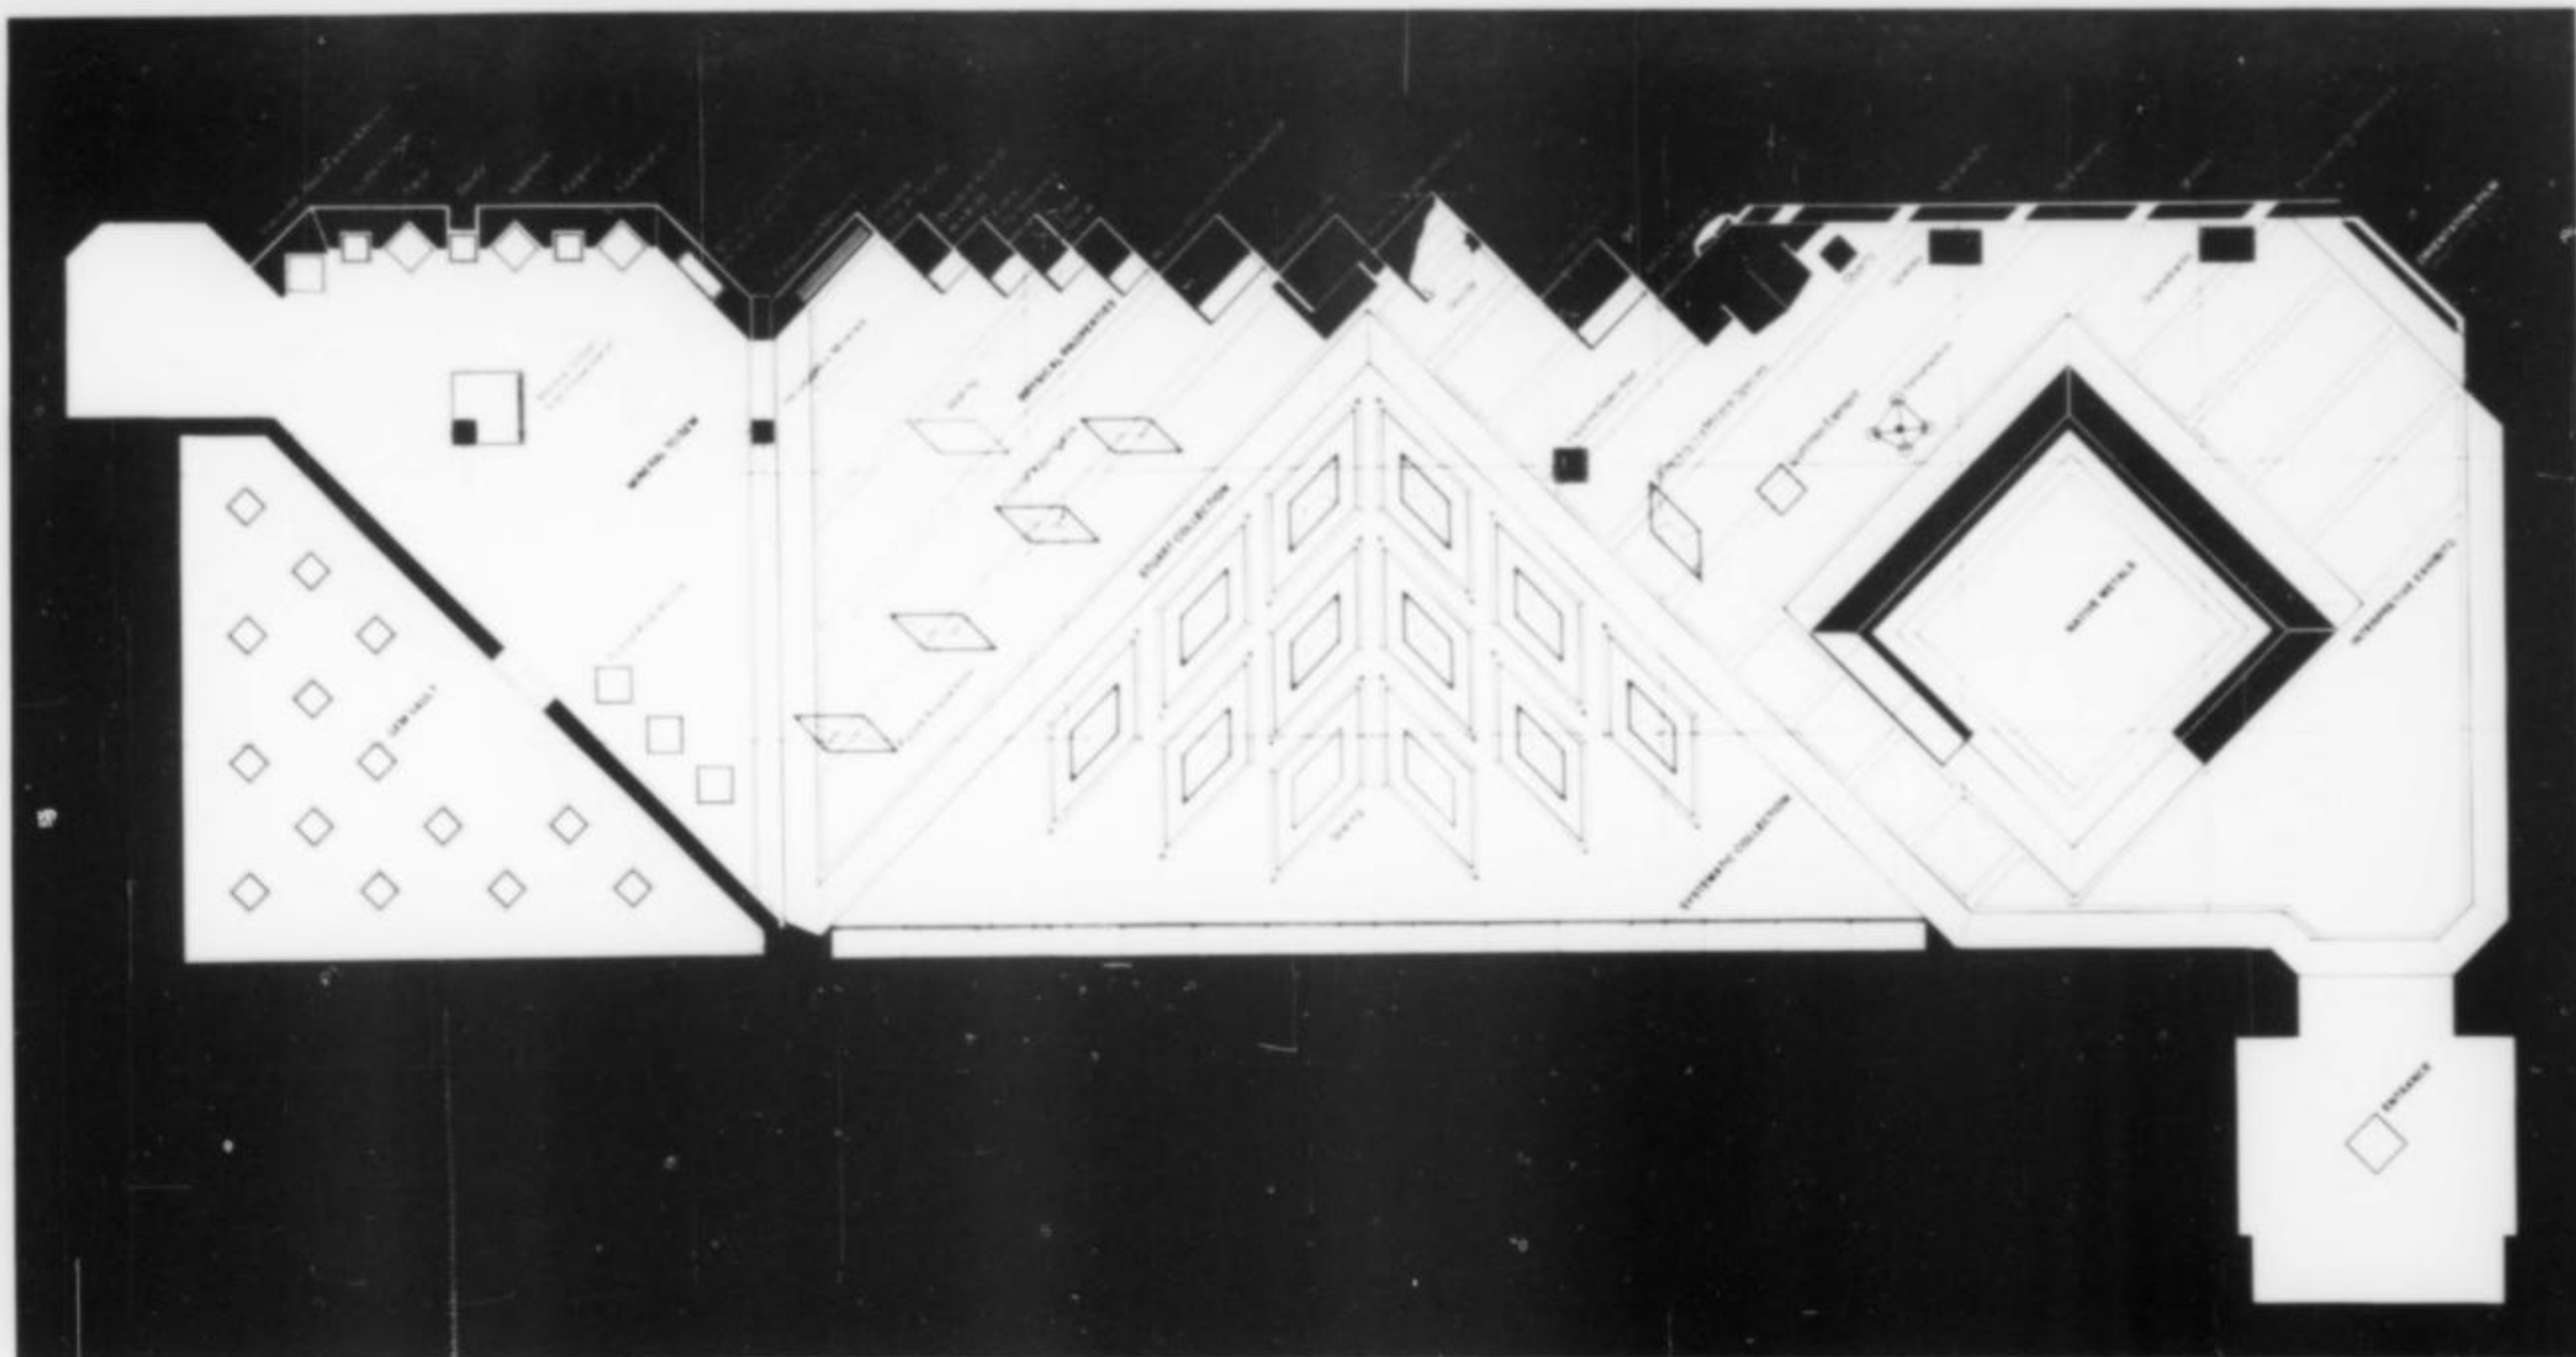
The floor plan of the new Mineral and Gem Hall. Its actual dimensions are about 134 x 42 feet.
